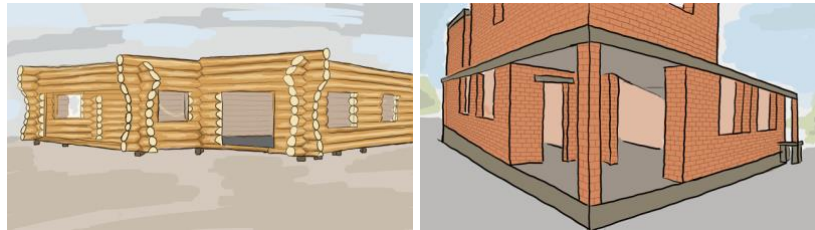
(from left to right) Wooden (log) masonry structural system; brick masonry structural system.
